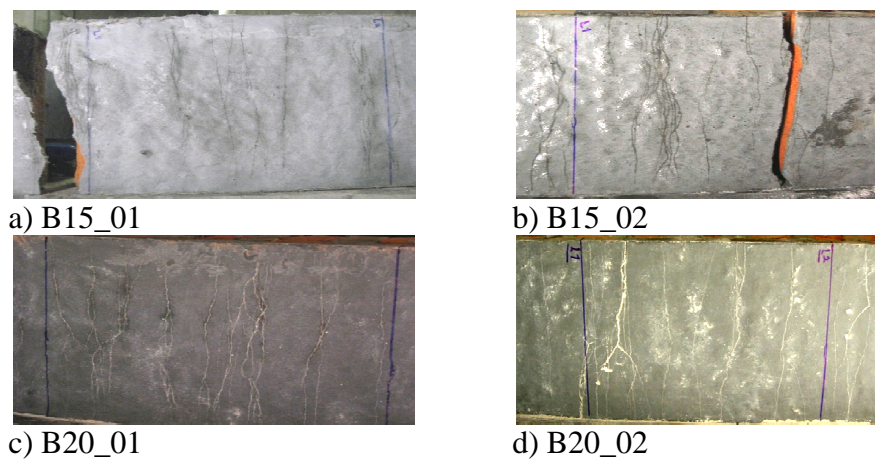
Flexural crack pattern for SFRCC strengthened specimens
